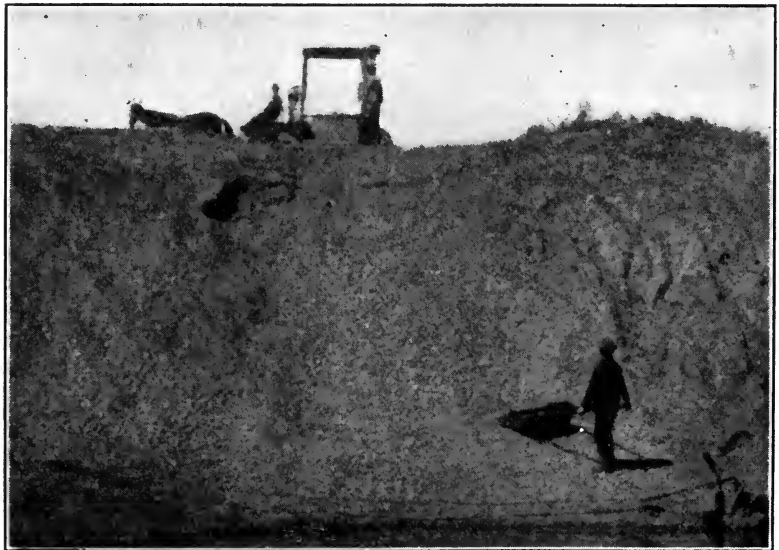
Scraper bucket excavator and loader excavating gravel pit.
